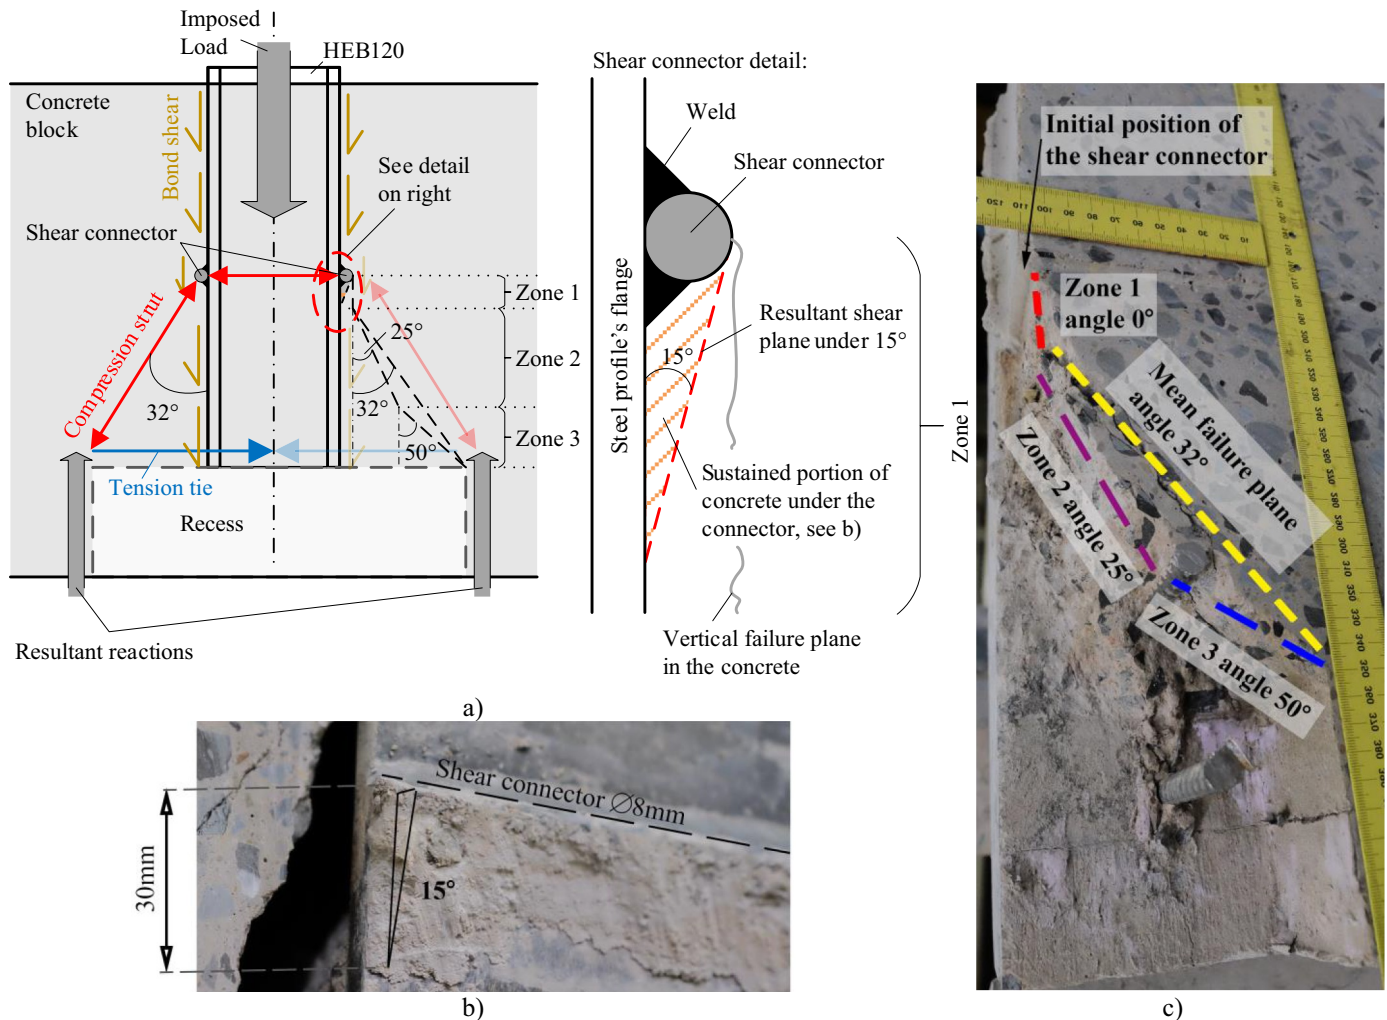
Av2 failure detail – a) scheme b) shear plane next to the connector and c) resulting failure planes in the concrete encasement (cut reference: line (c) in Fig. 10).
